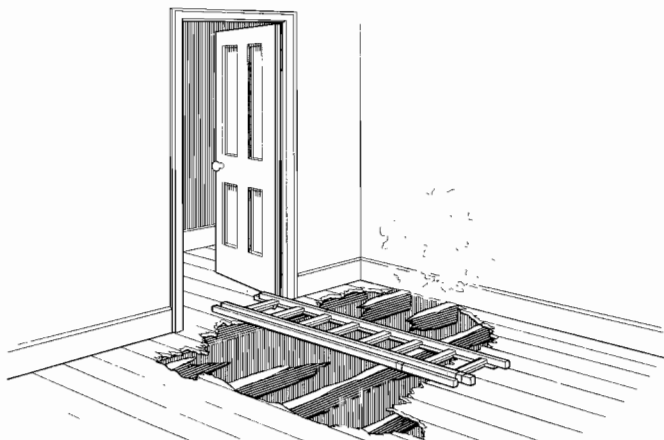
The bridging of a damaged floor by means of a ladder.
